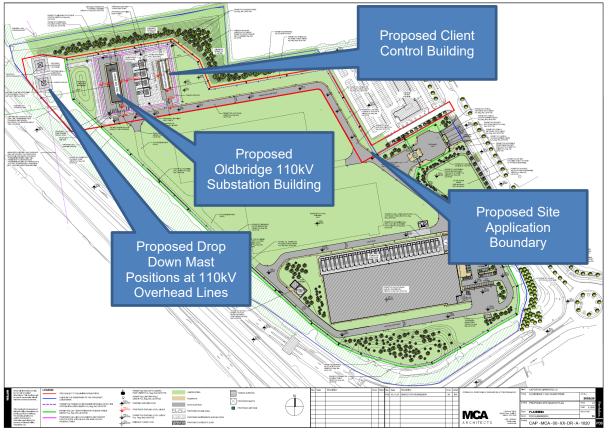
Proposed Layout of 110 kV GIS Substation, Transformers & Client Control Building
